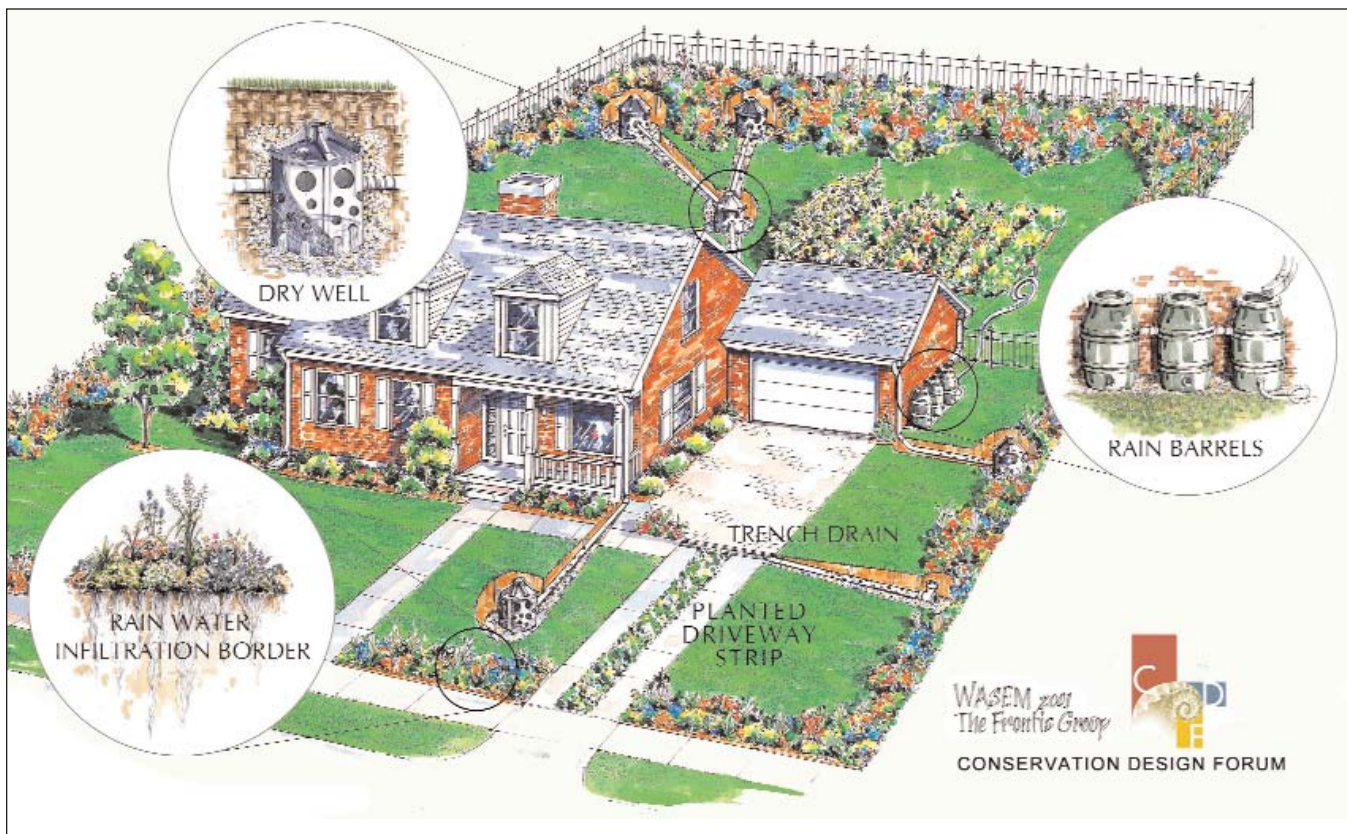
(above). Image of residential property with border planting, dry wells, rain barrels, infiltration trench, planted strip in driveway.
